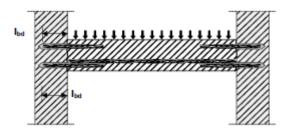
End anchoring of slabs or beams, designed as simply supported
